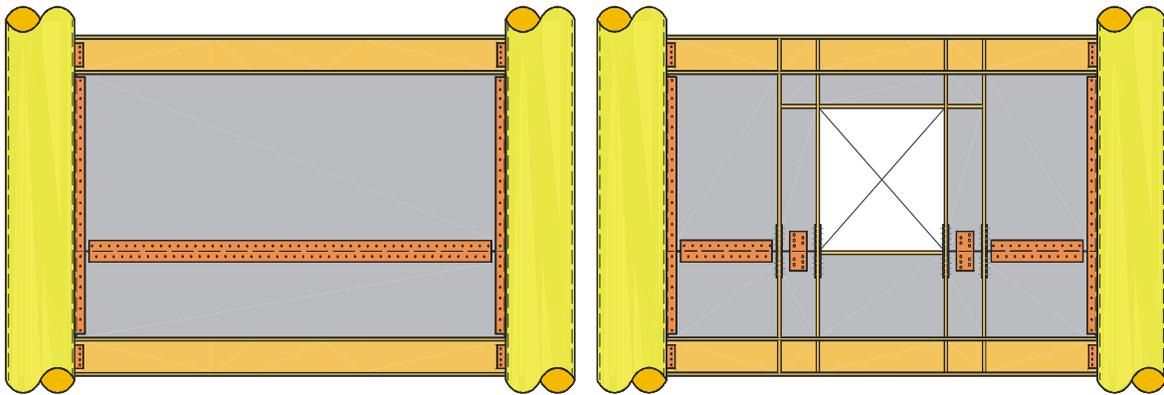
A typical SPSW bay with and without opening (after BPA Group)
